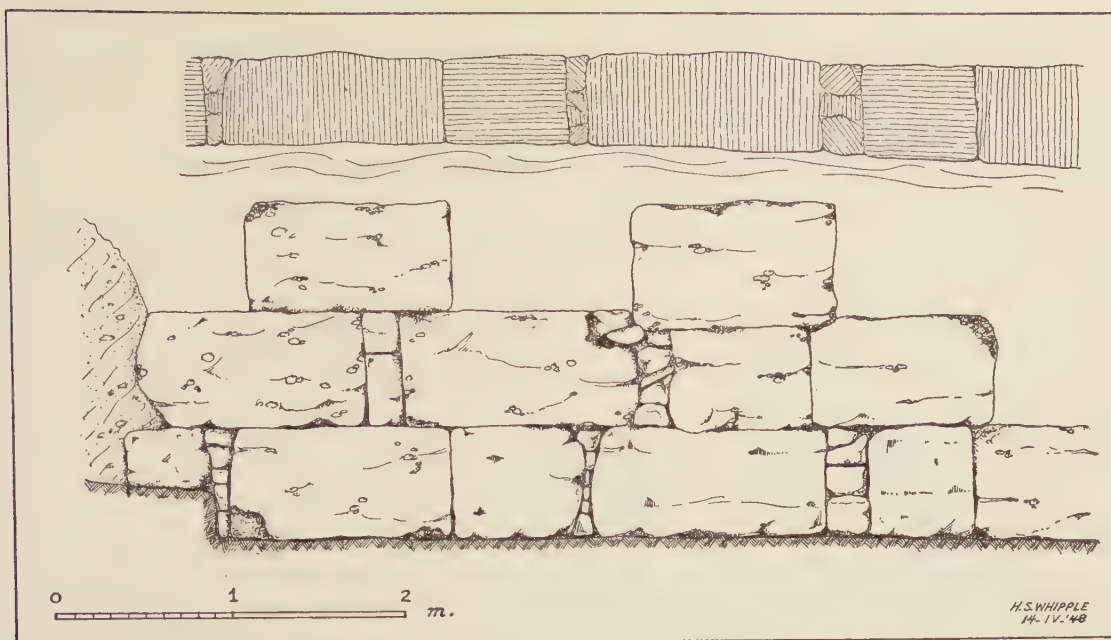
East Wall of Drain opposite House A: Elevation and Sketch Plan to Show Construction.
